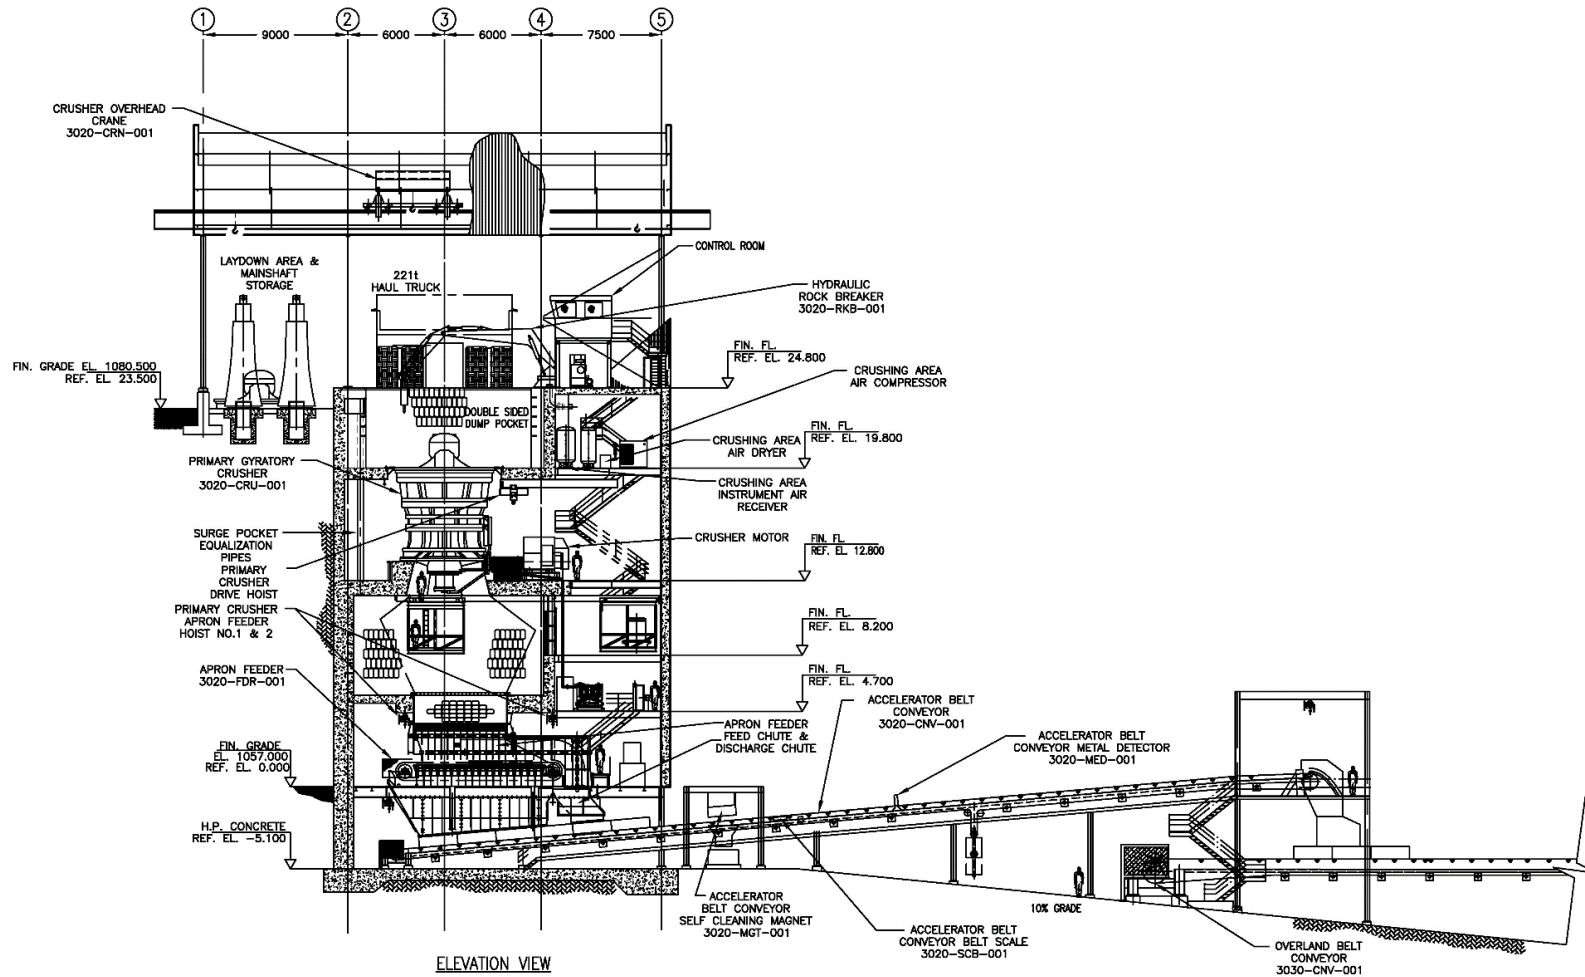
Preliminary Elevation Drawing for Primary Crusher
